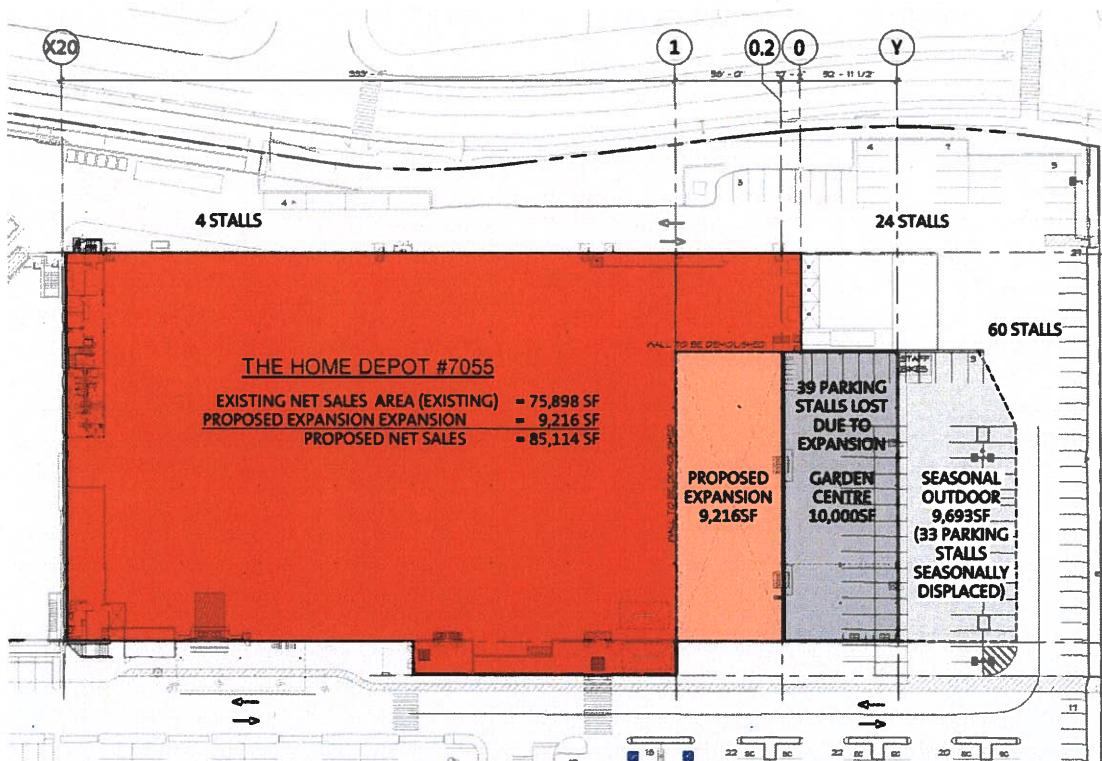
Proposed Home Depot Expansion –Site Plan (provided by Kubik Developments Corp)
